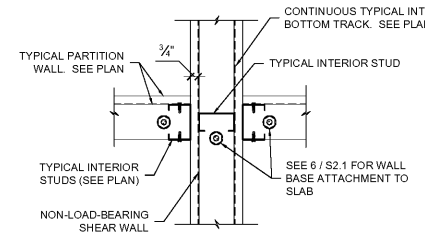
A OF SHEAR WALL CONSTRUCTION
